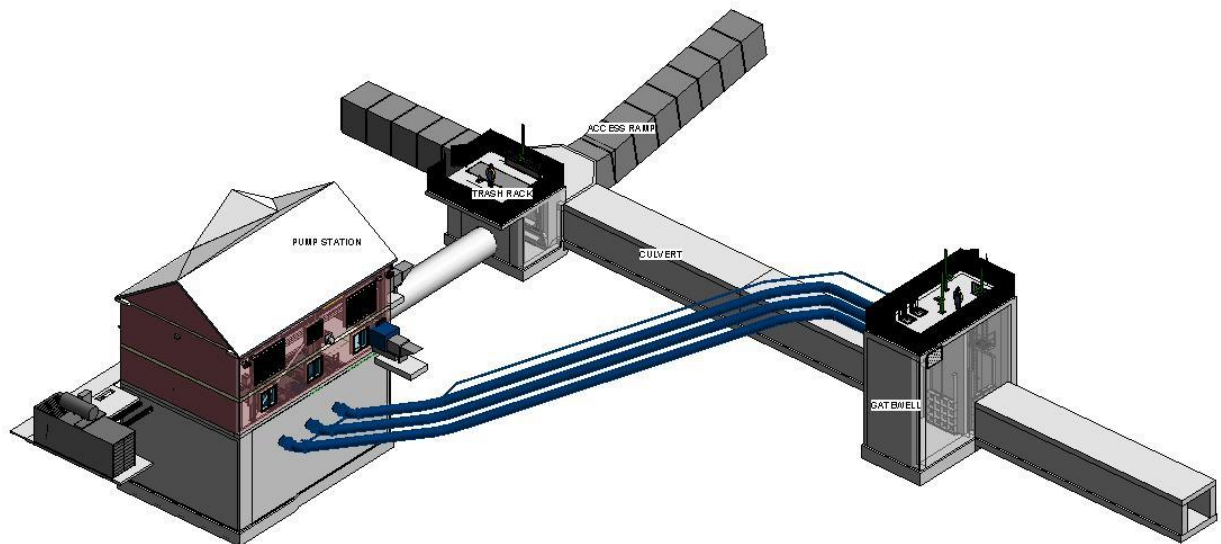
Perkett Ditch Pump Station, Gatewell, and Trashrack
